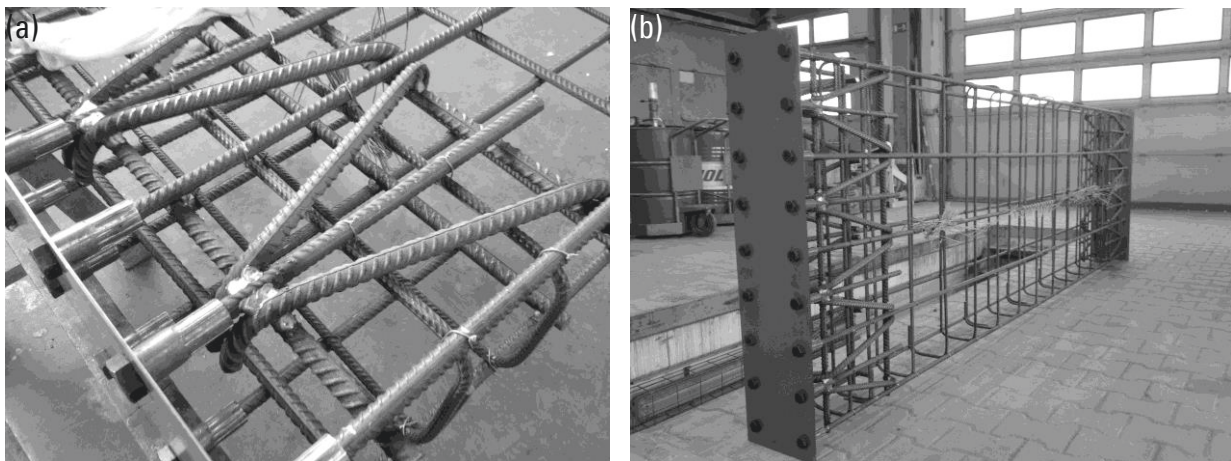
(a) View of the welded anchorage construction and (b) completed reinforcing cage after assembly
